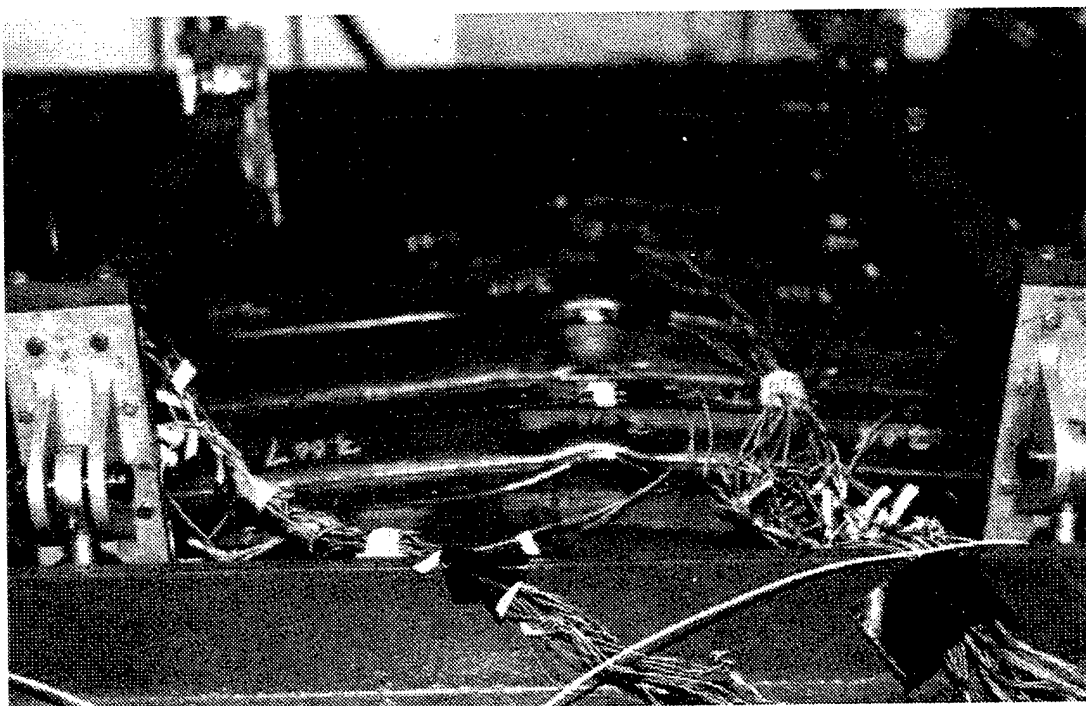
Center Bay of Grillage 0995 Showing Stiffener and Plate Deformation
